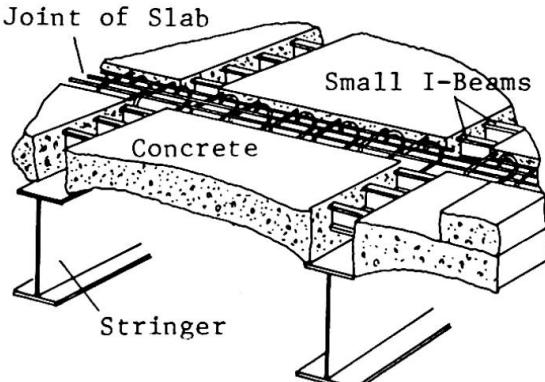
Detail of Precast Concrete Steel Grating Floor
